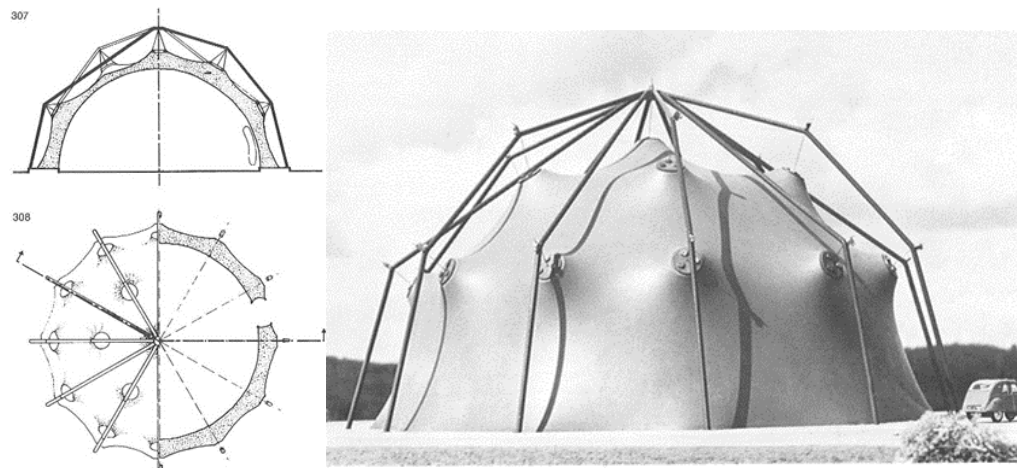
Section, plan & model view. (Herzog 1976: 109)
